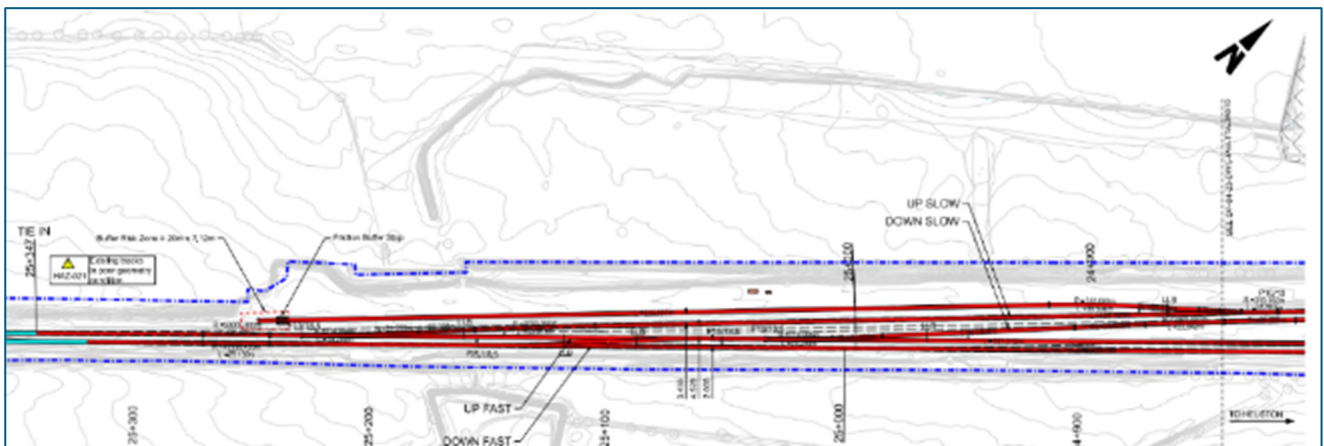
Hazelhatch & Celbridge Station – Track Plan Layout (1 of 3)
